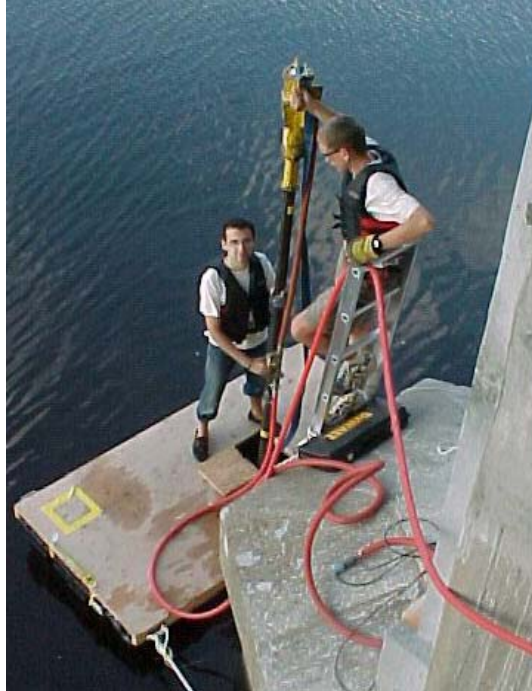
Installation of MSC at Route 46 Passaic Bridge (August 2000).
